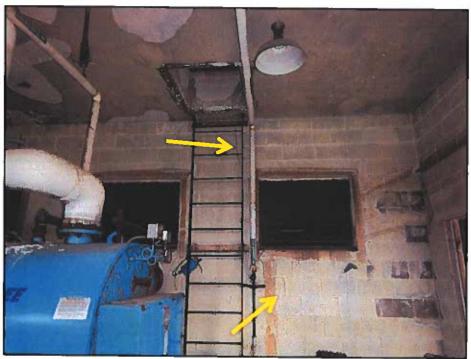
Large cracks at the roof access wall. This wall is an interior wall to the conditioned space on the right side of the building
